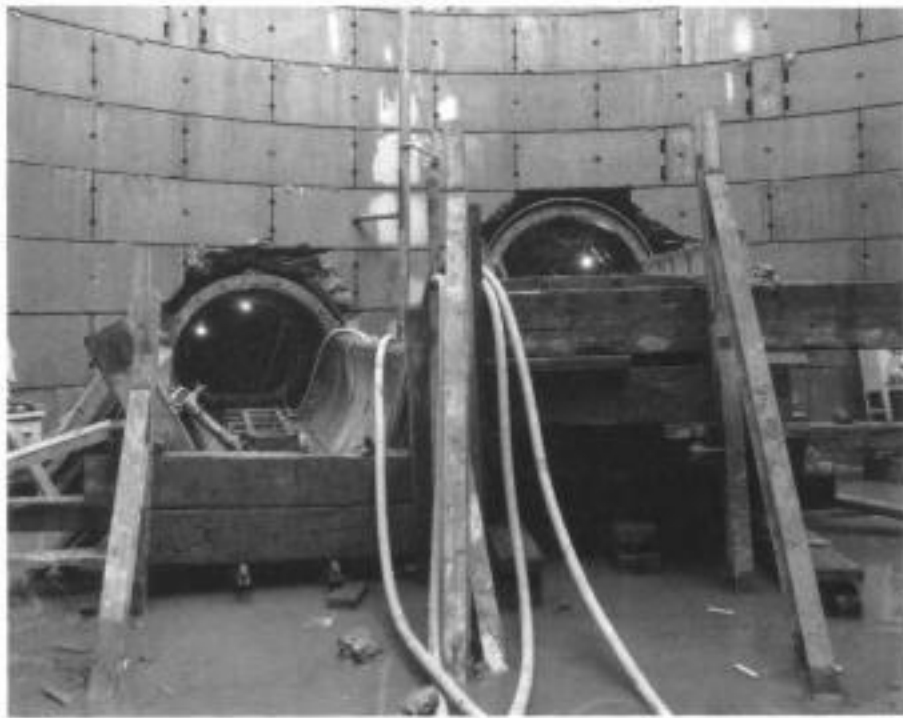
Single-pass lining to line tunnel break-out shaft (courtesy of Charcon)
